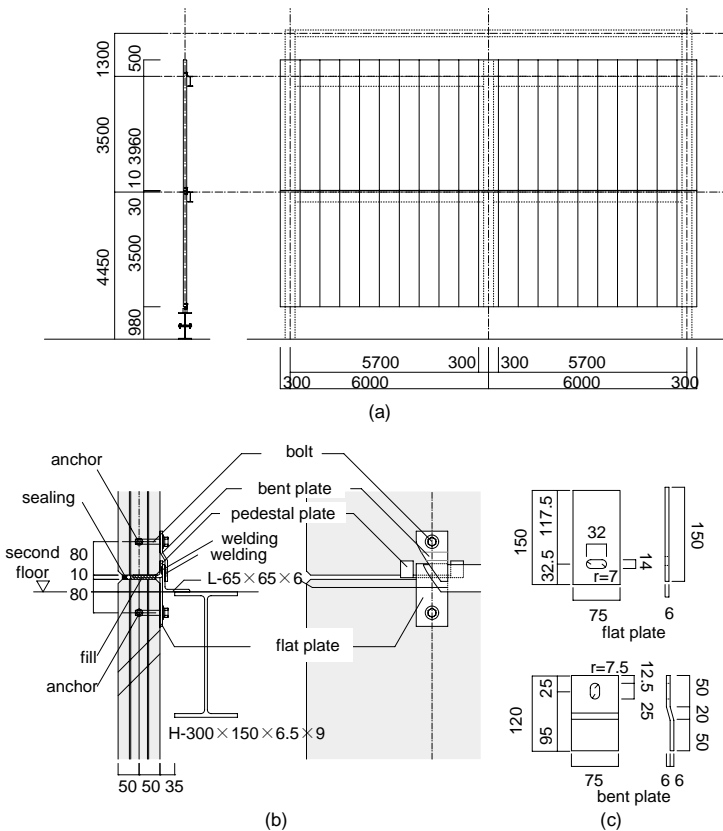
Installation of ALC panels: (a) elevation; (b) attachment to edge beam; (c) plates with slotted hole.
